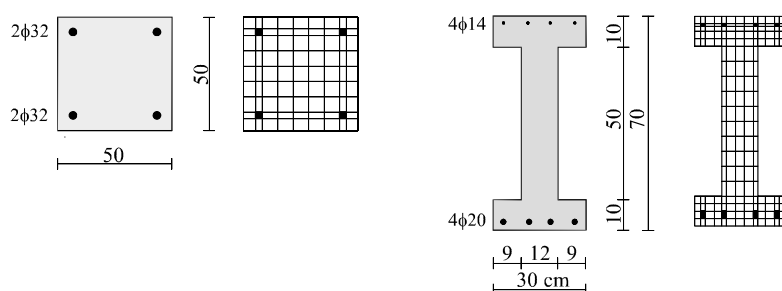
Discretization of reinforced concrete frame cross-sections, columns and girders
